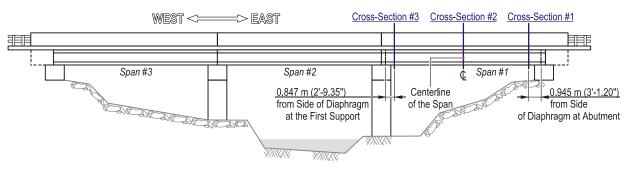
Location of the instrumented cross-sections for the tested bridge
